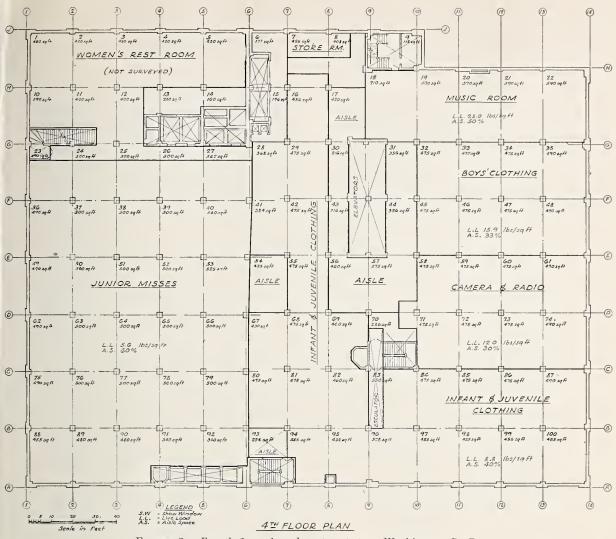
Fourth-floor plan, department store, Washington, D. C.
